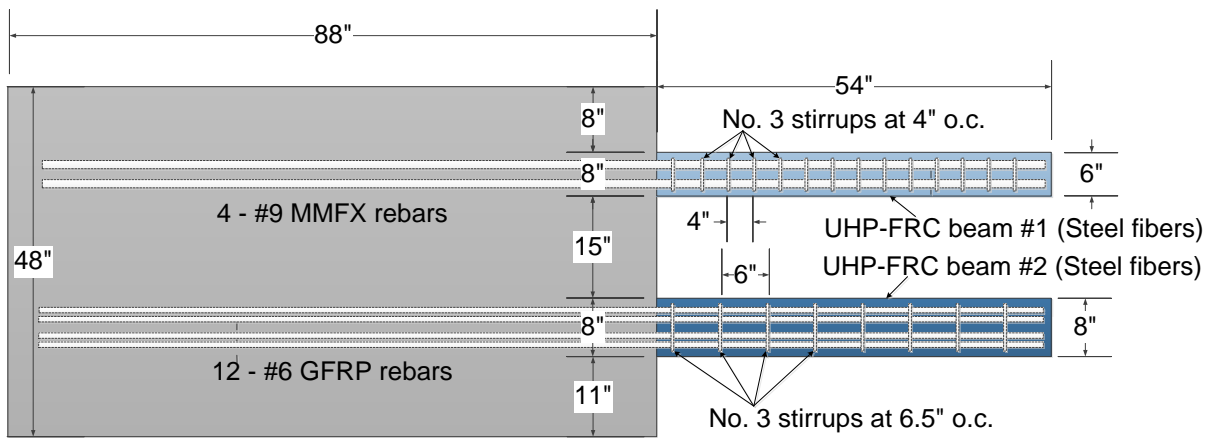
Detailed side view of the specimen showing specimens UHP-FRC #1 and #2.
